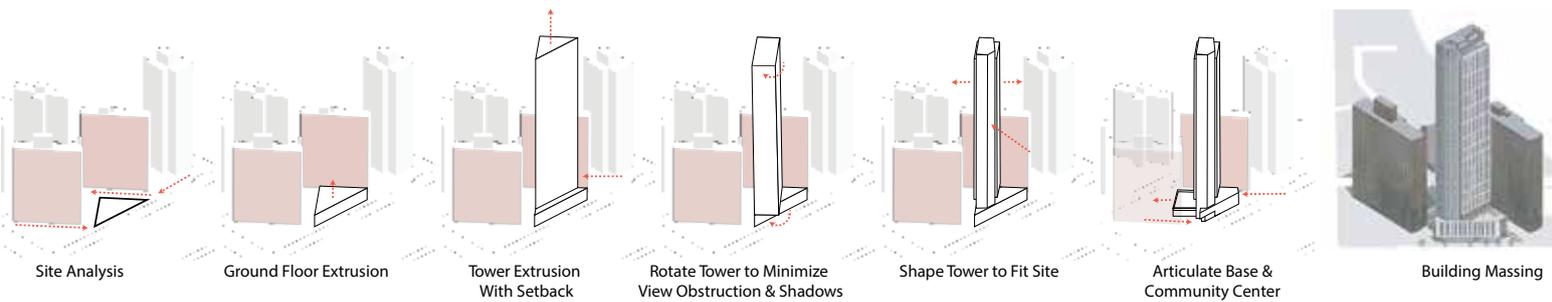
The building massing strategy positions the new tower centrally between its predecessors, while adding street frontage. © FXCollaborative
